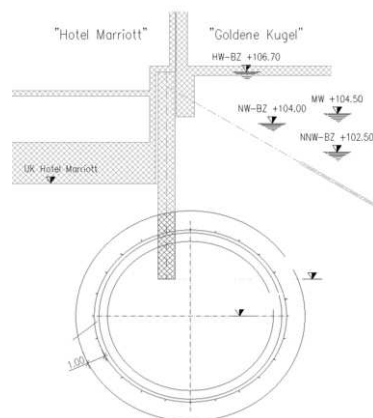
Cross section of the bored pile wall and tunnel (Kirsch and Richer)
